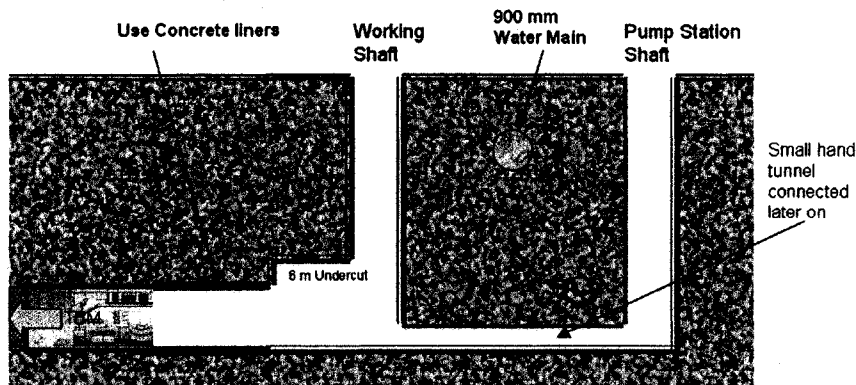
GLENCOE STORM TUNNEL PROJECT OPTION D (SMALL UNDERCUT, CONCRETE LINERS)
